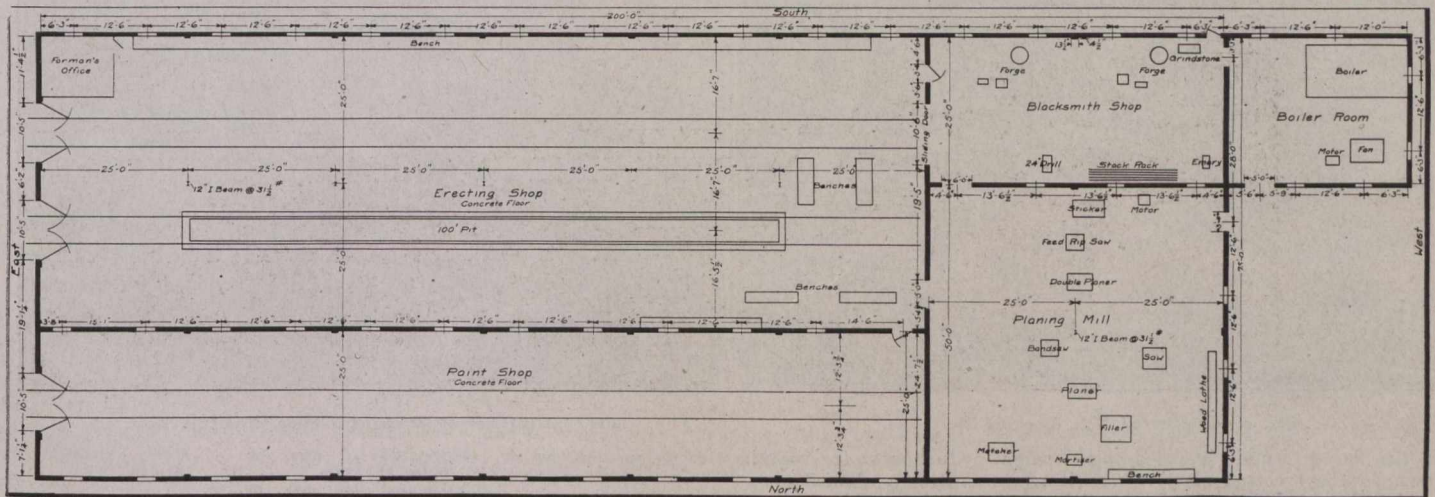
Plan of Winnipeg Electric Railway Car Building Shops in Fort Rouge.
